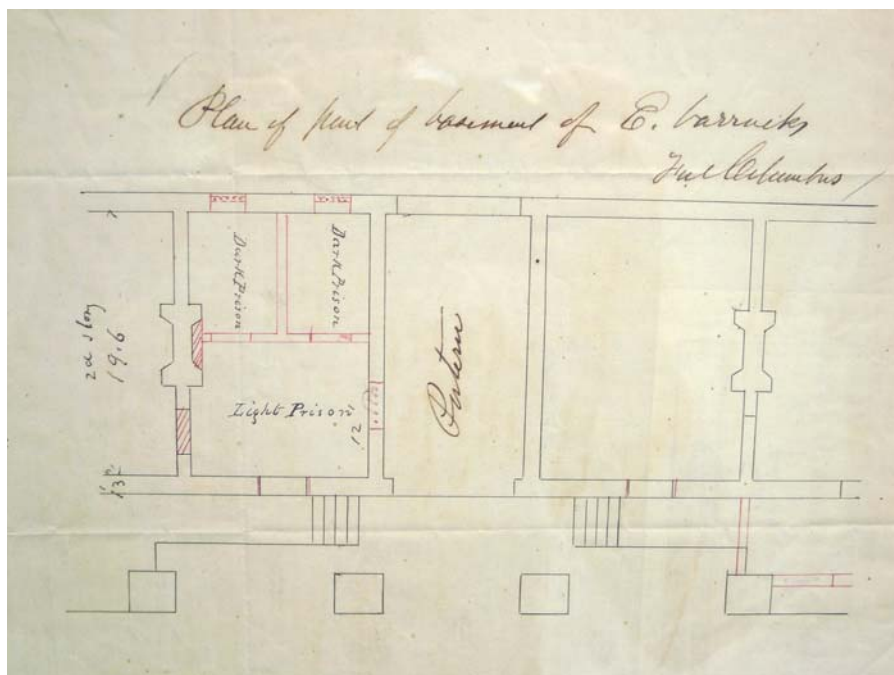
Plan of the basement in the east barrack showing the proposed placement of prison cells, June 1857.
